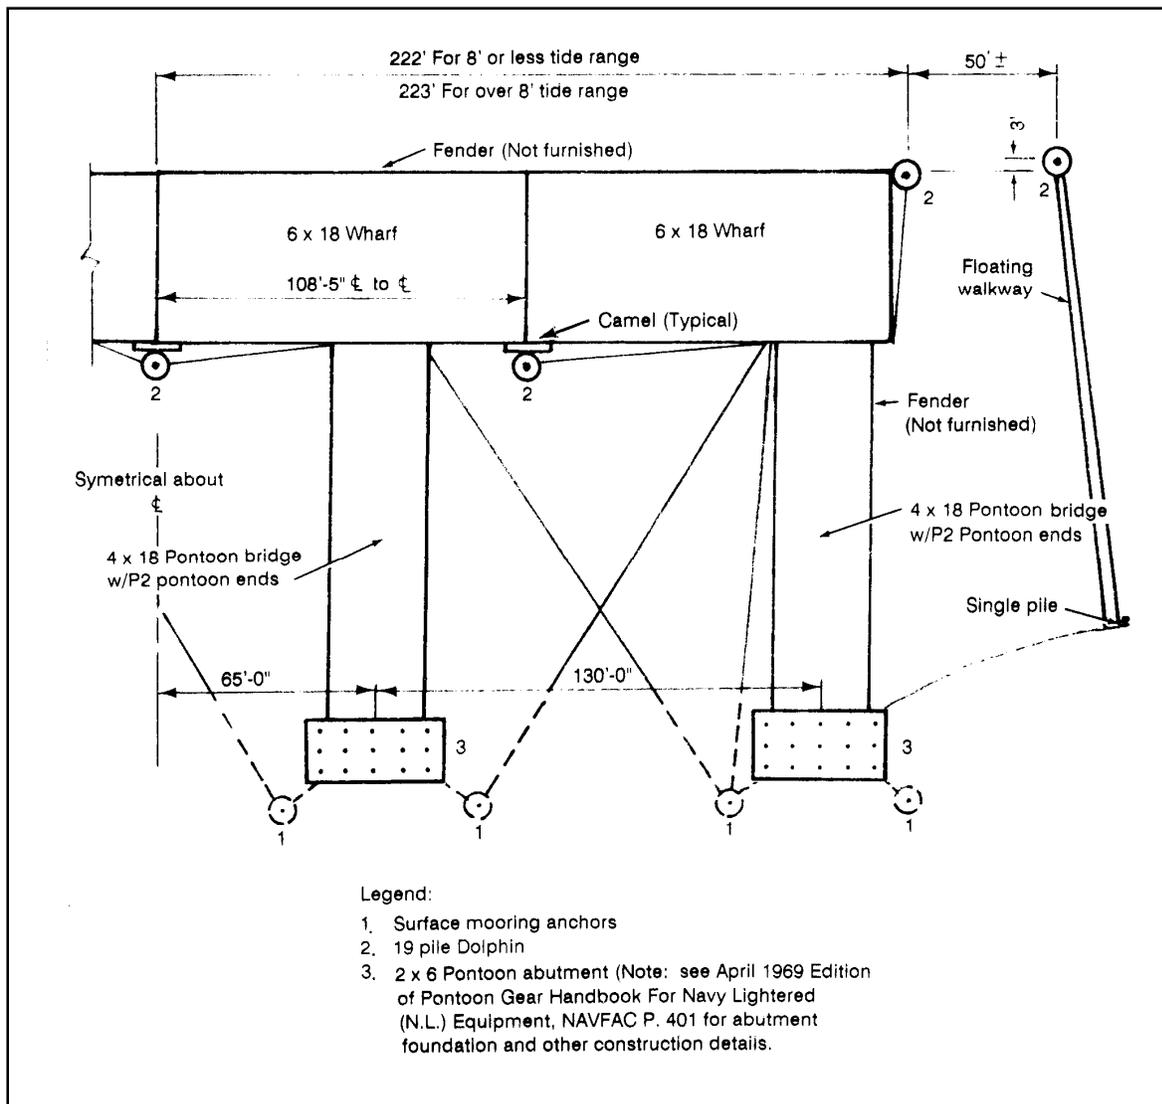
Causeway arrangement 1 (with pontoon wharf)
